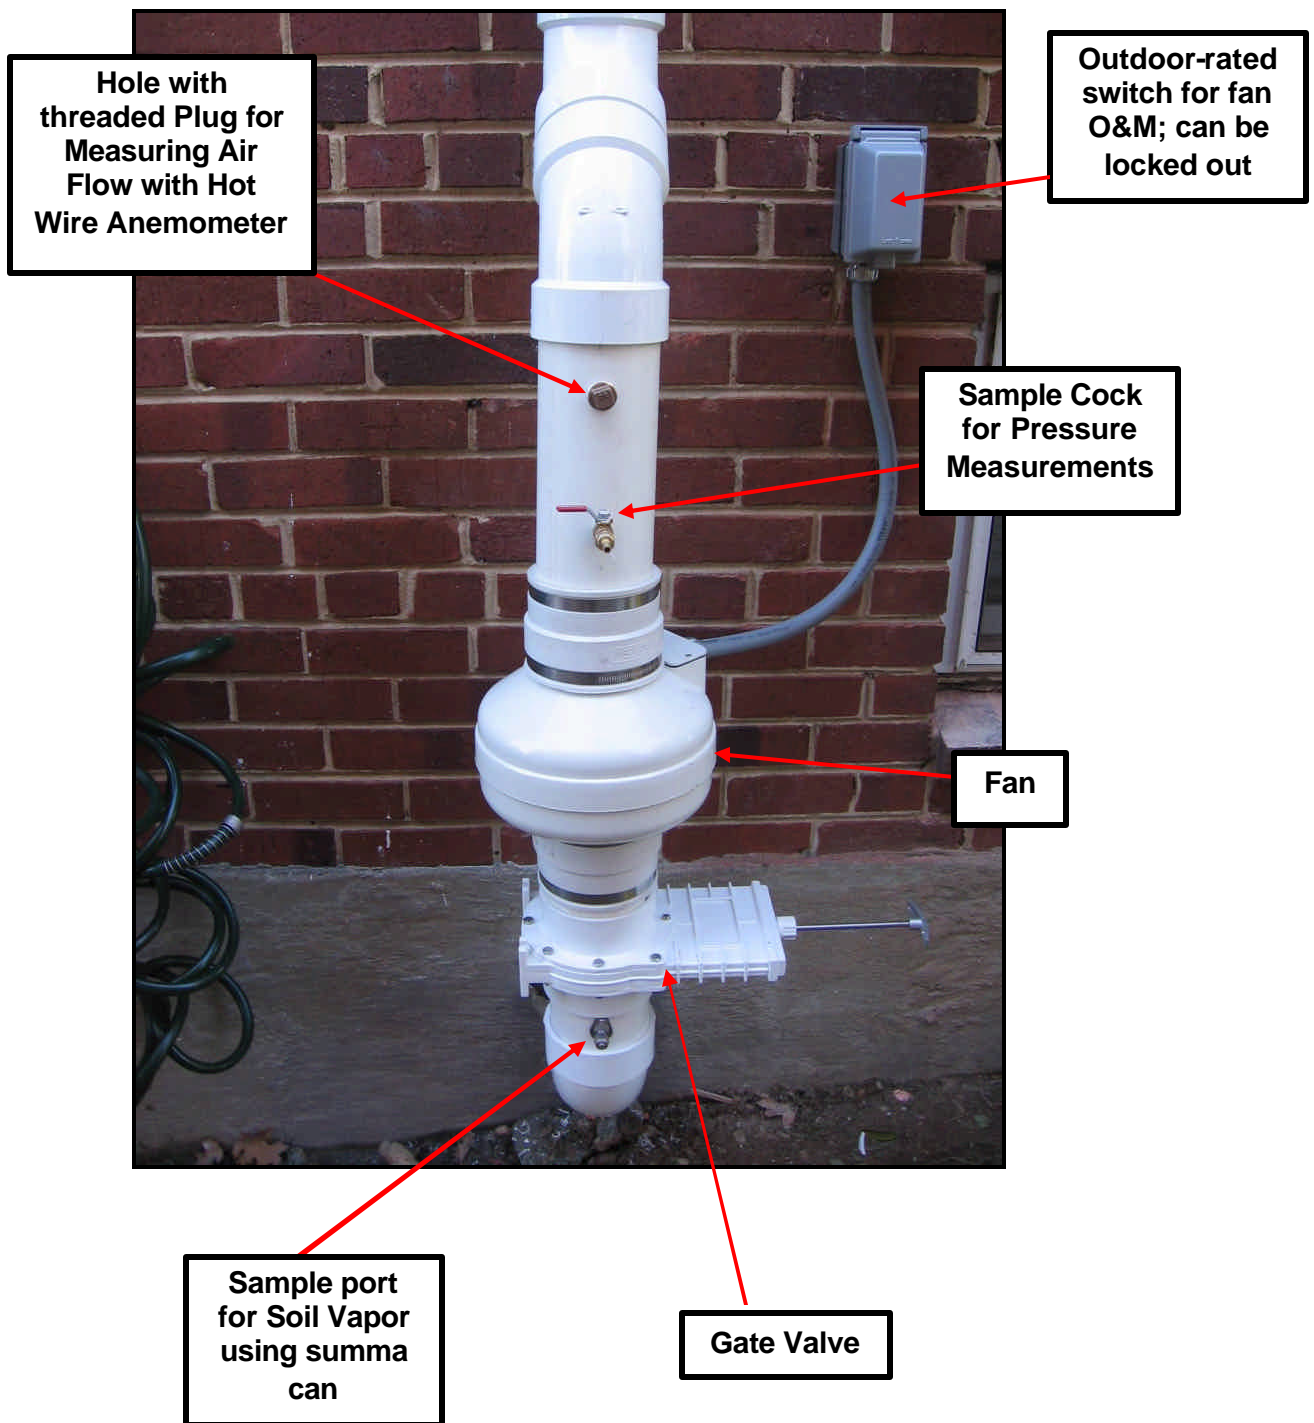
View of the fan and piping. The gate valve isolates the piping such that a soil vapor sample can be collected prior to the fan.
